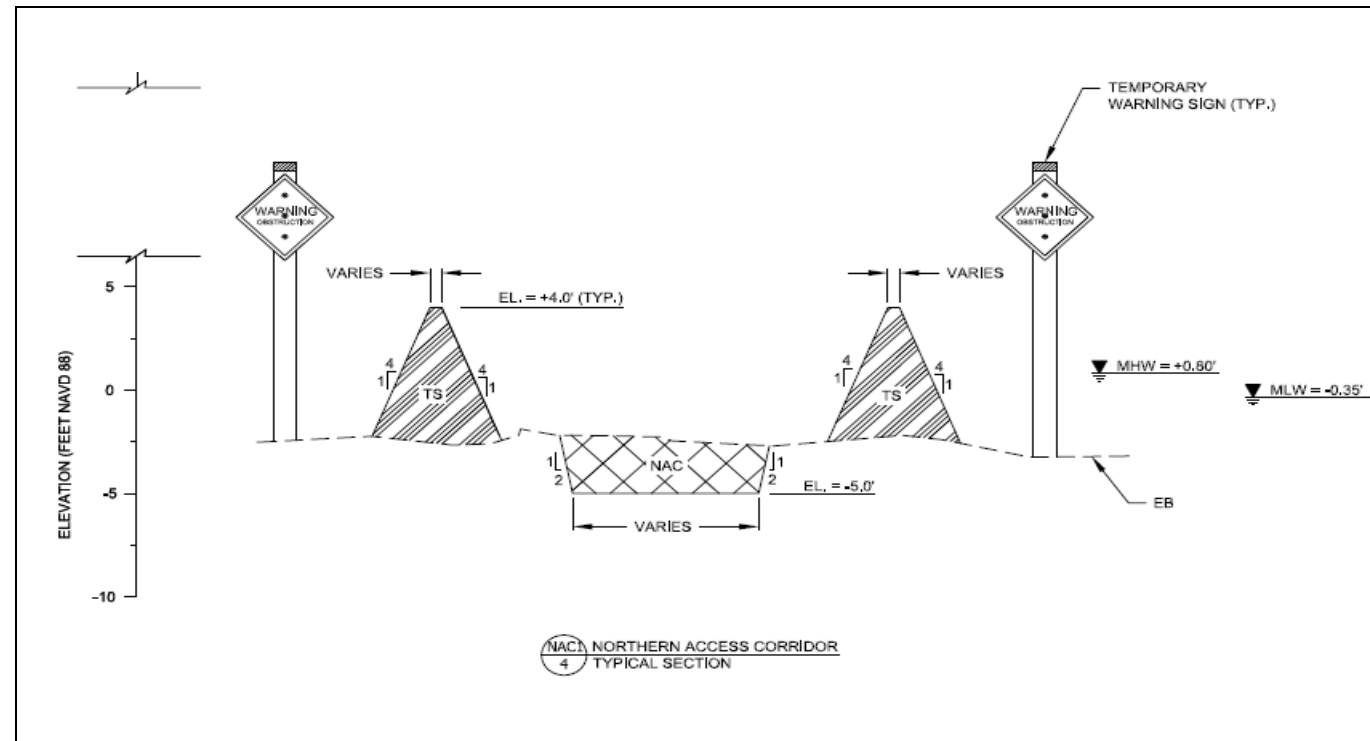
ACCESS CORRIDOR TYPICAL SECTION
